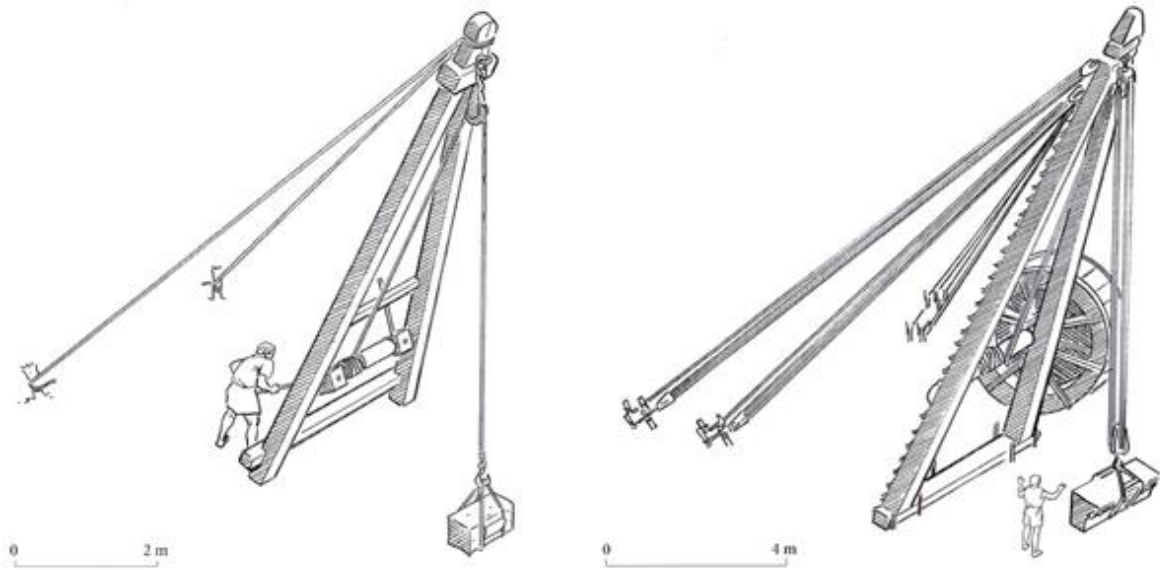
Reconstructed images of cranes used for hoisting blocks of stone. On the left a simple crane and on the right a crane with a treadwheel in which men could walk to provide extra lifting capacity (Malacrino 2010:147).
